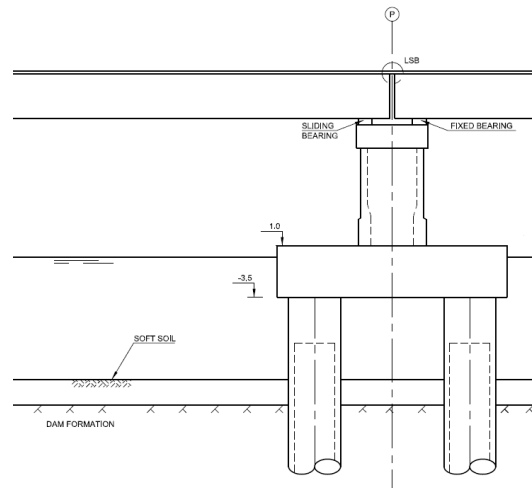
Qatar-Bahrain Causeway Bridge, link slab
